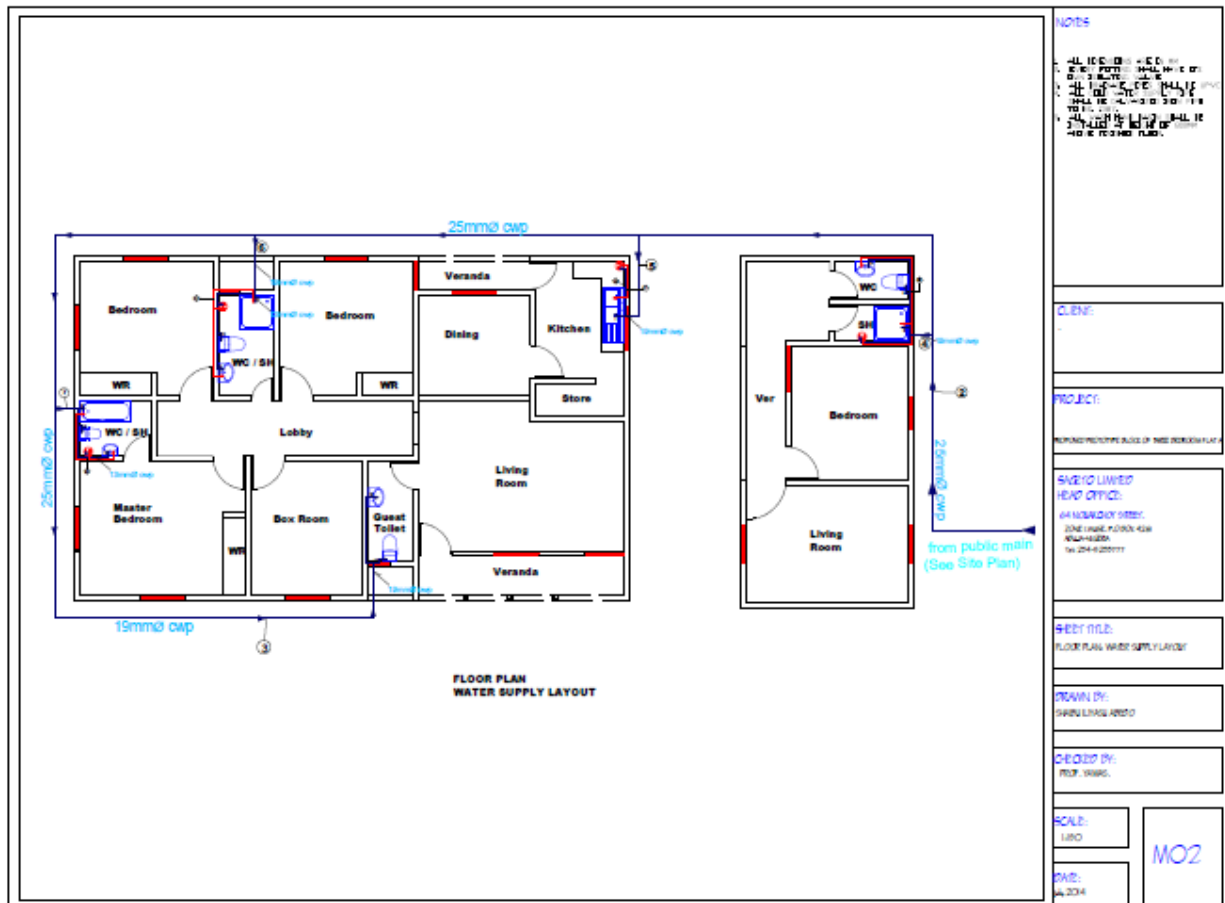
Floor plan water supply layout of the three bedroom bungalow
